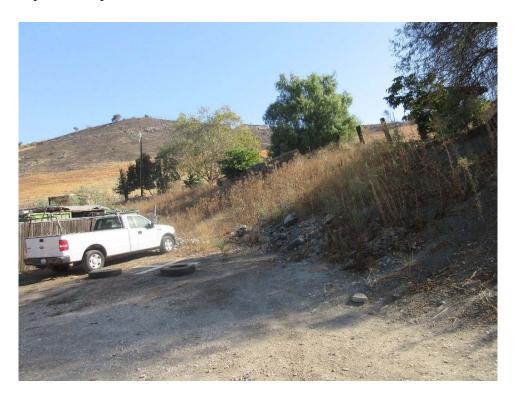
The on-site access road, looking north from the southern area of the project development footprint
